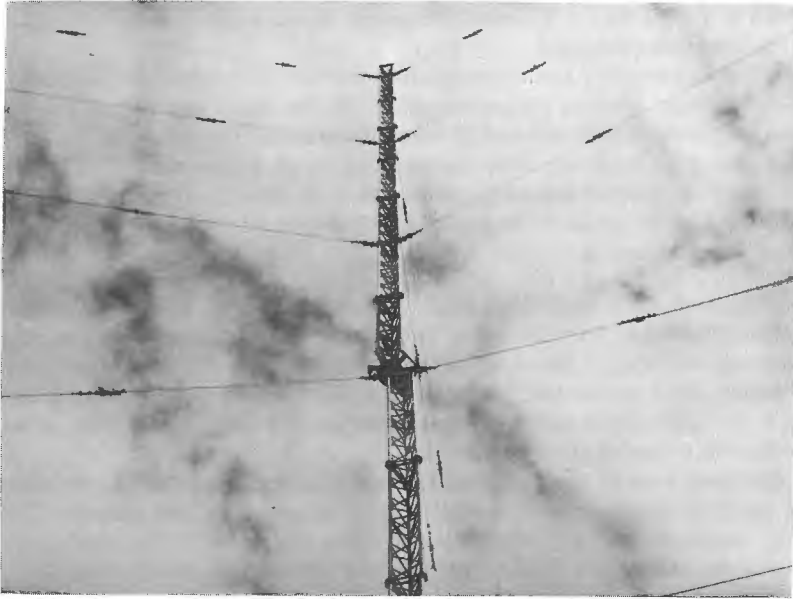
Displacement of top section after fracture of sectionalising insulator
